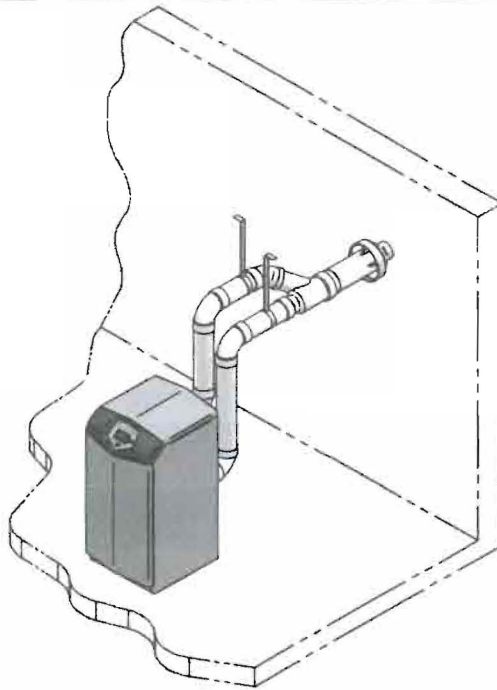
PVC/CPVC Concentric Sidewall Termination - See page 25 for more details
